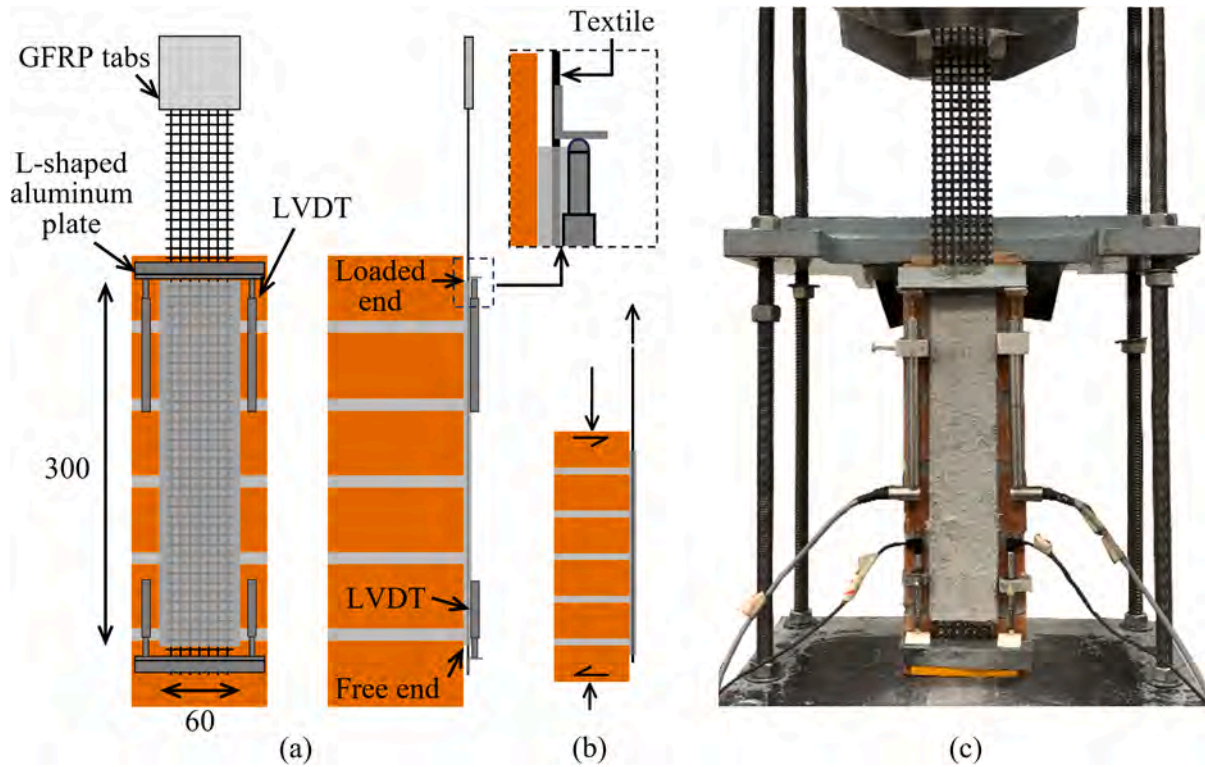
Direct shear test set-up: a) sketch of the specimen geometry (dimensions in mm), b) free body diagram, and c) photo of a control specimen with bare textile.
